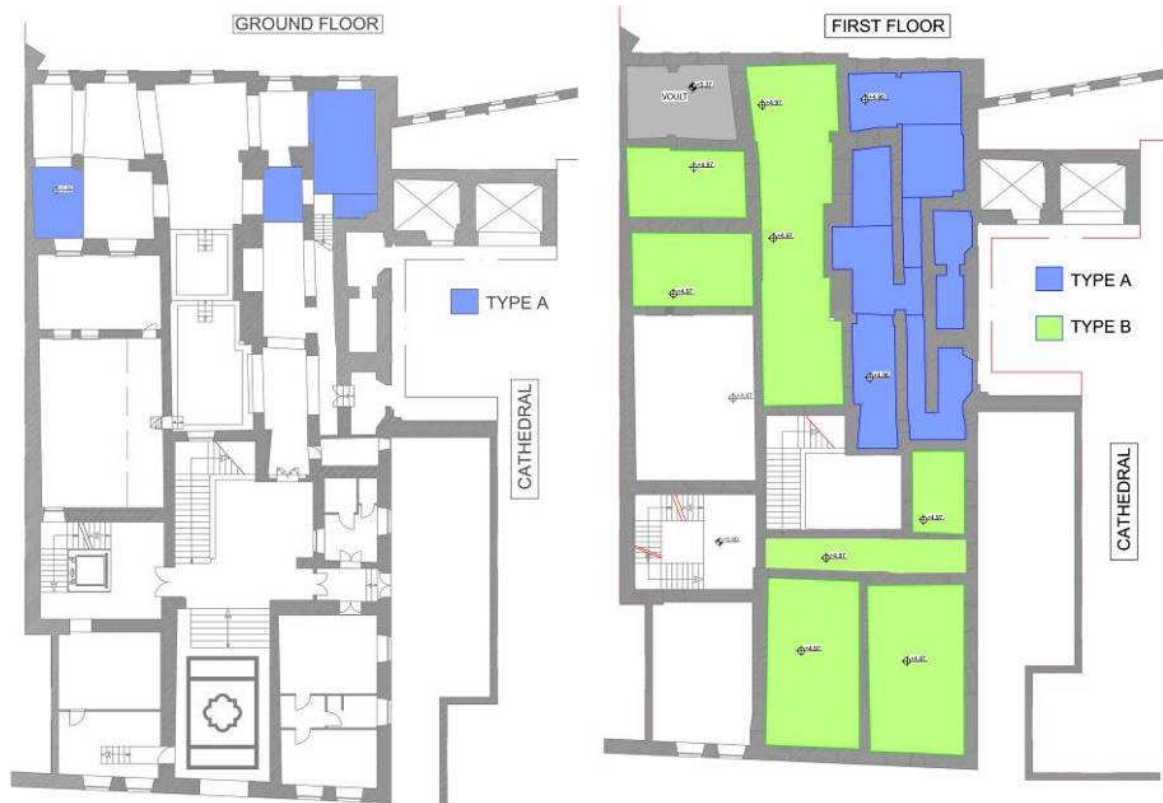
Ground floor and first floor plans (Type A HEA beams – Type B HEB beams).
